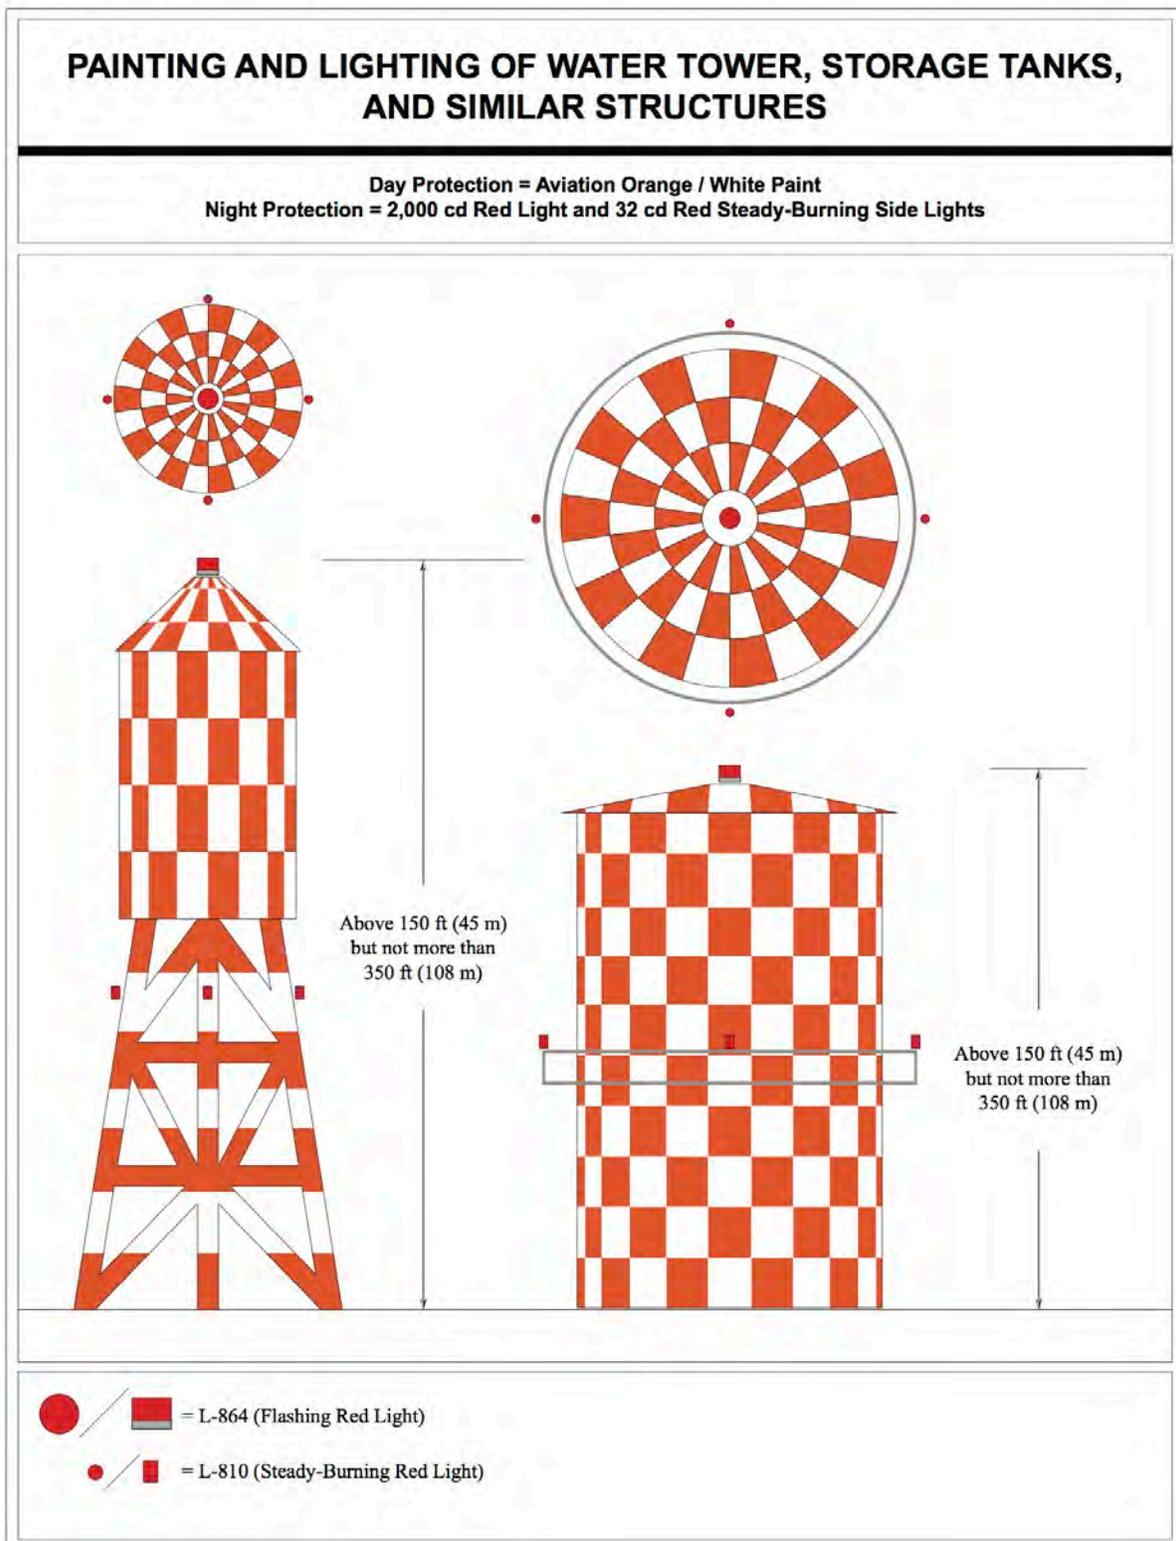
Painting and Lighting of Water Towers, Storage Tanks, and Similar Structures
